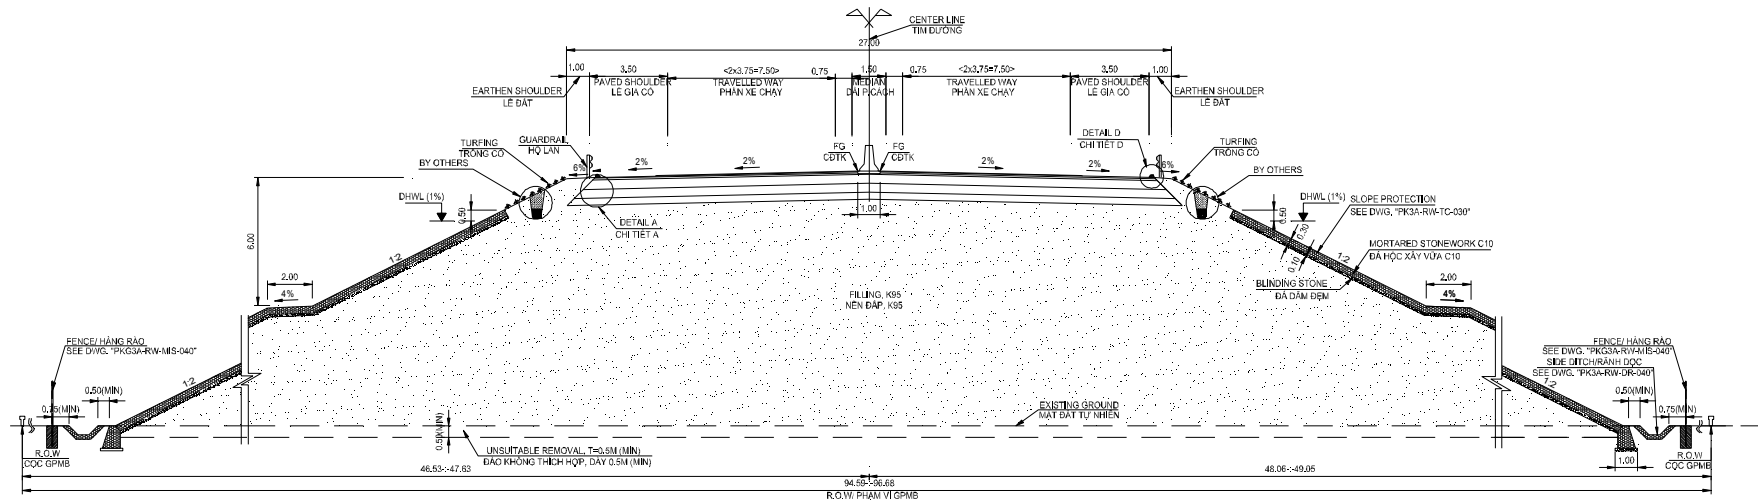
(c) Typical Cross Section of Bridge Approach (KM18+025.20-KM18+035.20)
